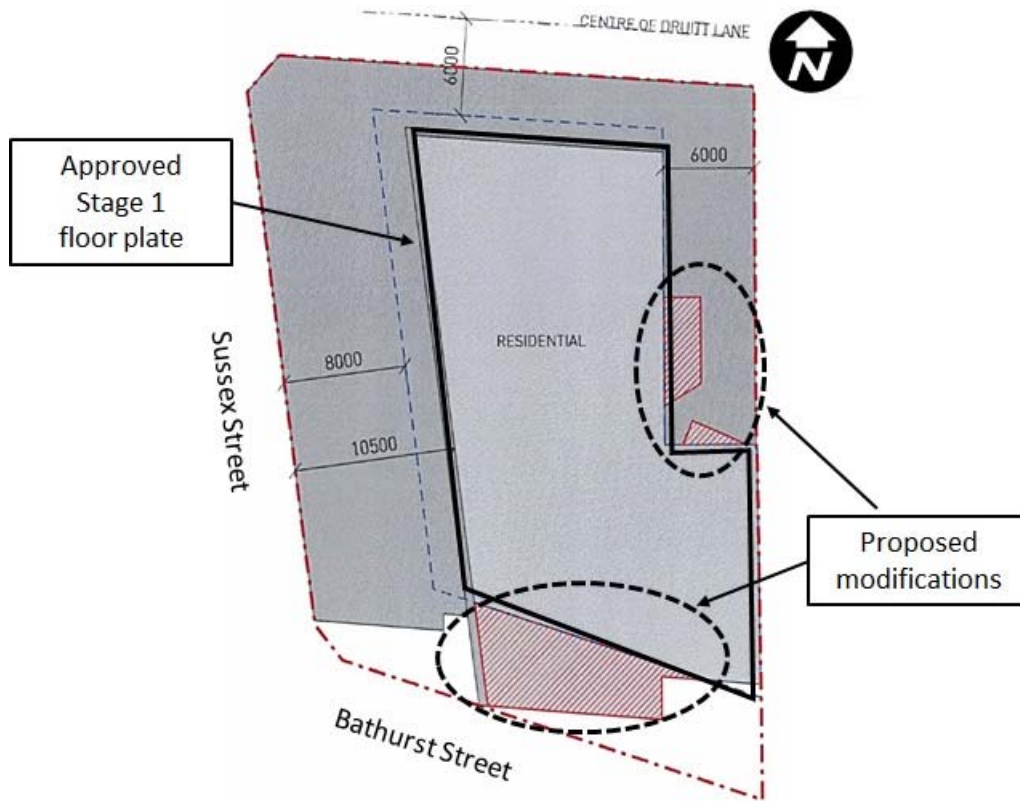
Proposed modifications to floor plates – levels 9 to 10.
